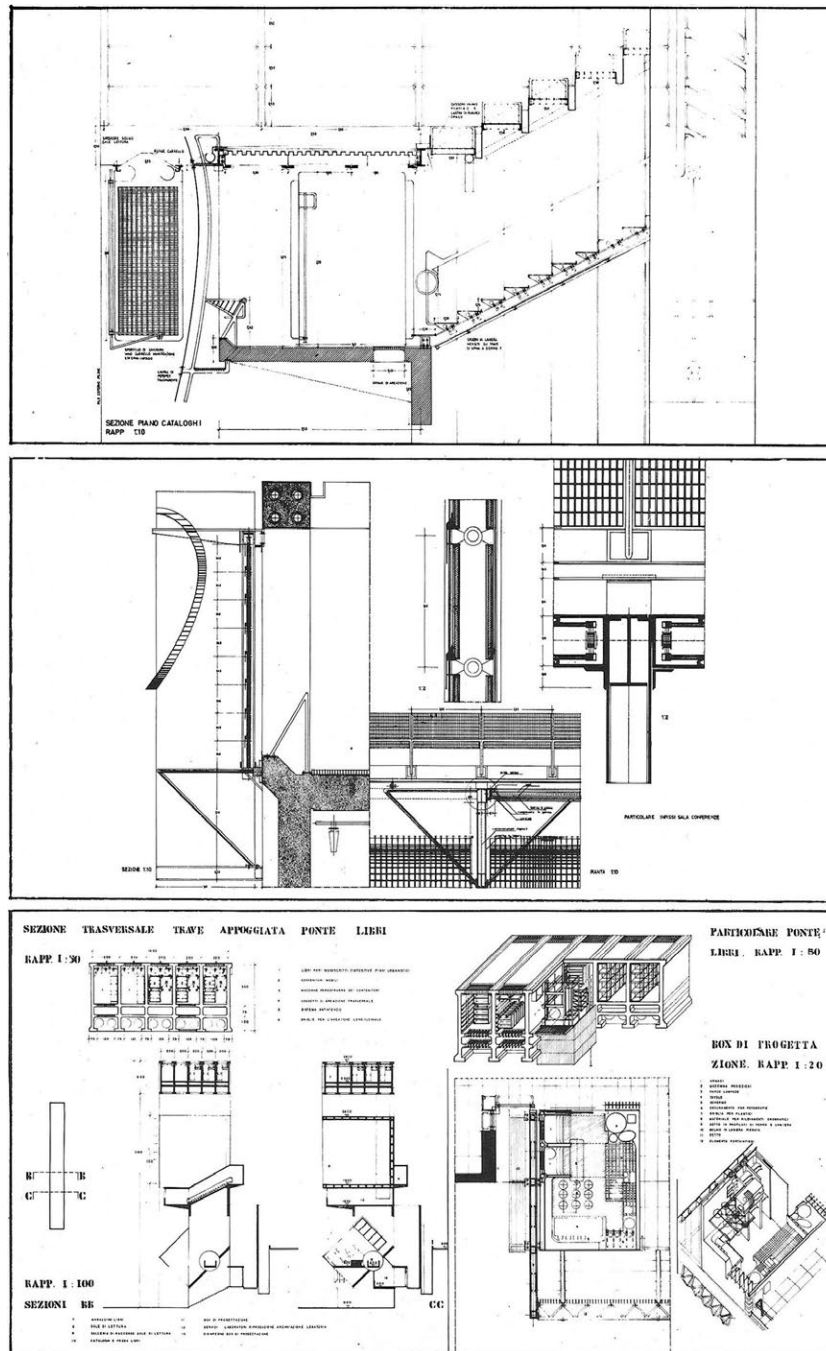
From top, to bottom: Detail of the ramp connecting the reading rooms to the catalogue area; The framings of the bridge overhang bracket; Cross section and detail of the book storage area.
